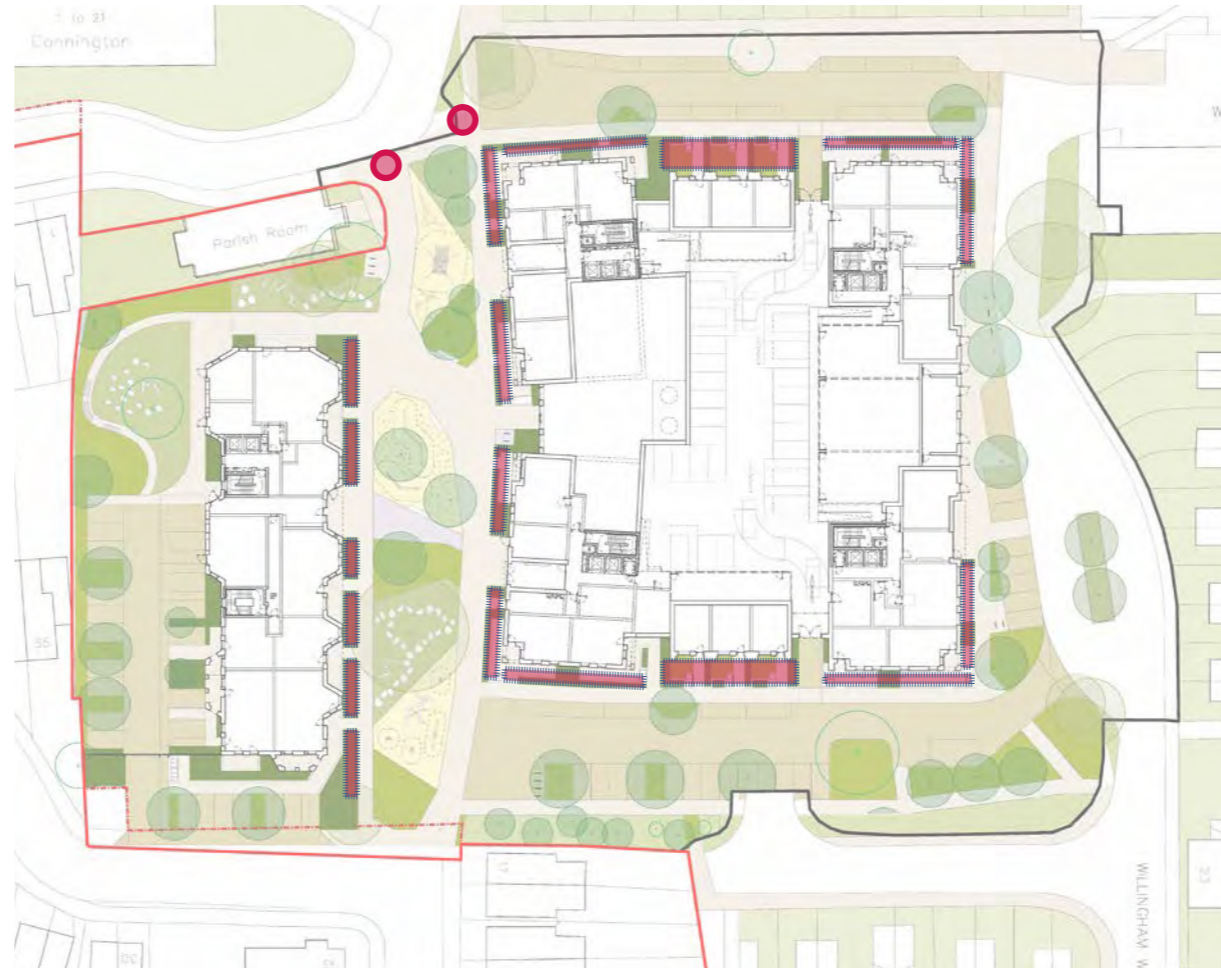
Proposed ground floor landscape plan, Plots B and E
